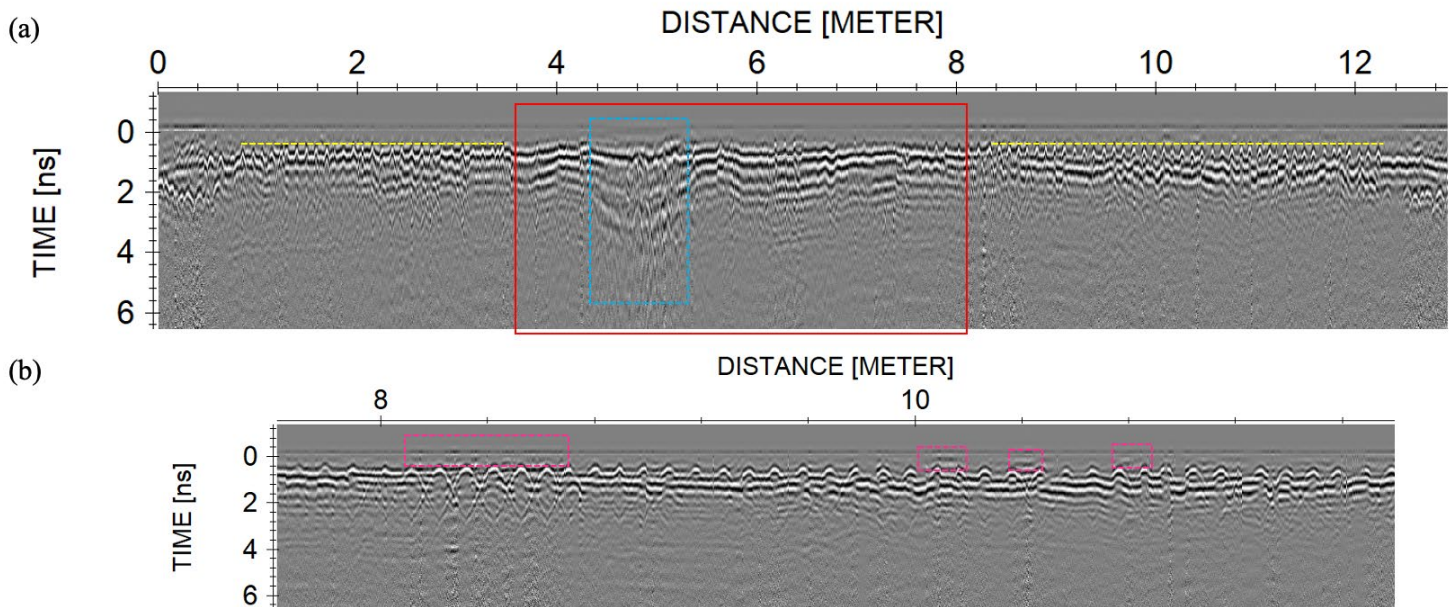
Radargram produced showing concrete deterioration and rebar corrosion at the central part of the bridge (highlighted into a red box). A more detailed section is presented in (b) to show cracked and delaminated areas (highlighted into dashed pick boxes).
